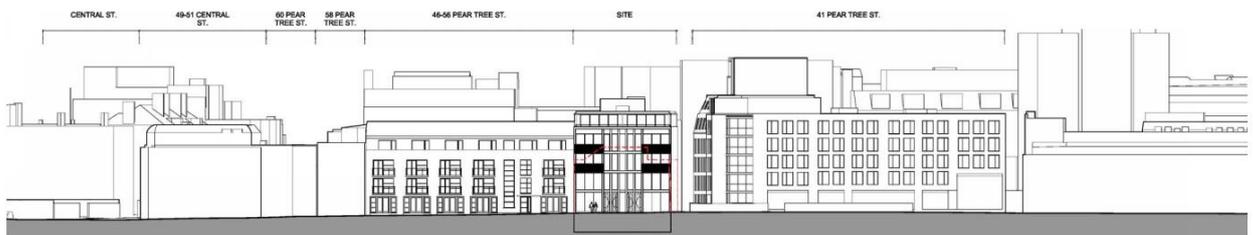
The scale and massing of the proposed building in relation to the surrounding properties on Pear Tree Street and Central Street.
